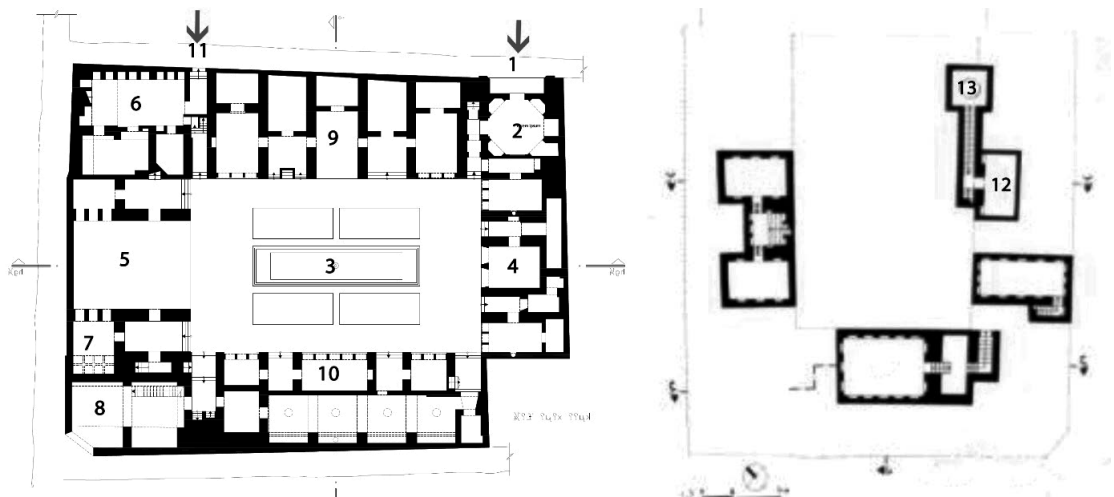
Spatial arrangement of rooms (Ground floor plan and Basement)
